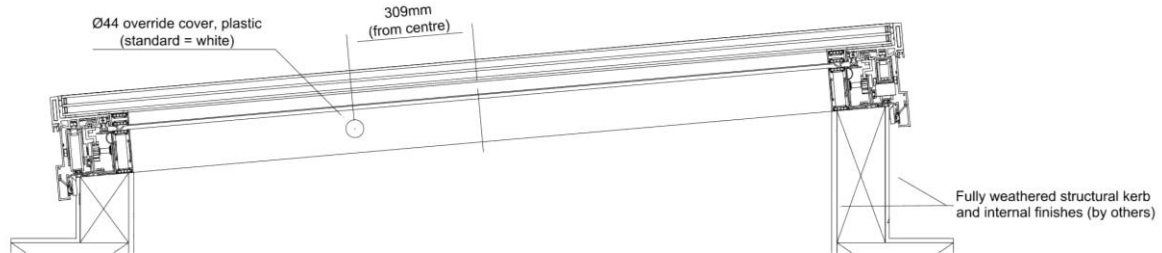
Operable Glazing Skylight Roof Detail
